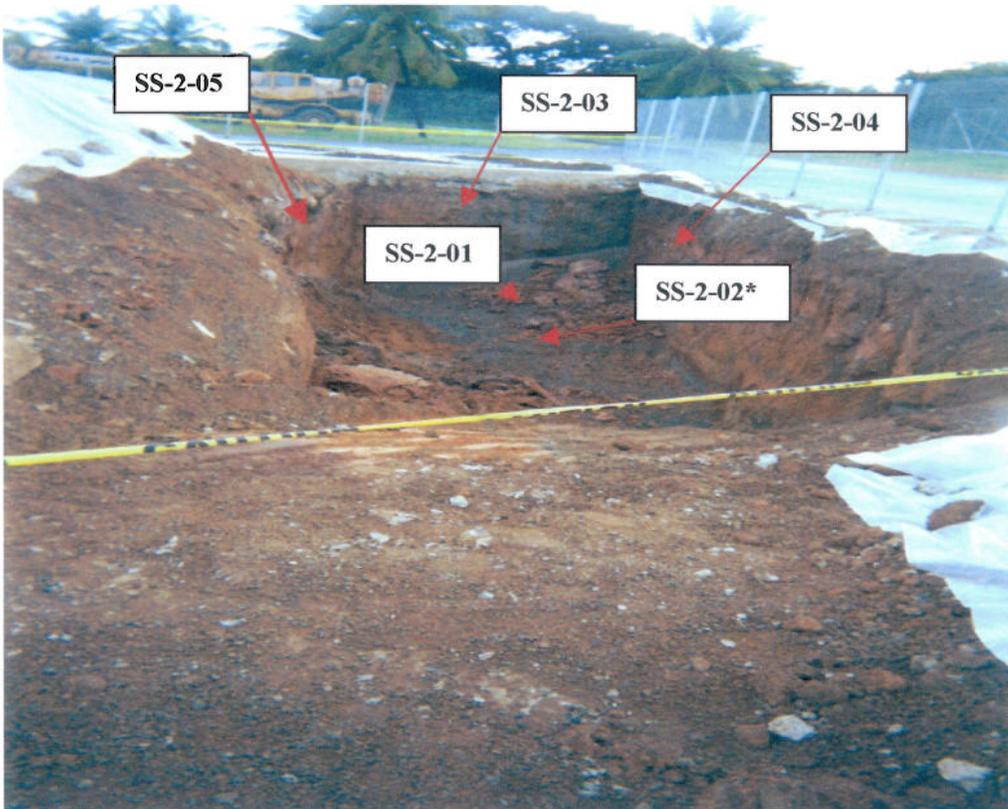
Sample locations for Mogas tank. View is southeast of Building 2015.
